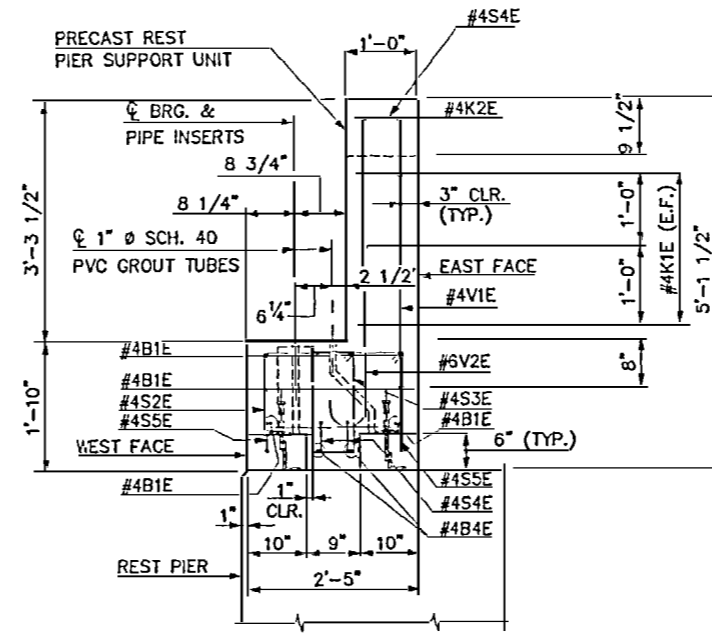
DETAILS OF ANCHORAGES @ EAST FACE OF REST PIER SUPPORT
